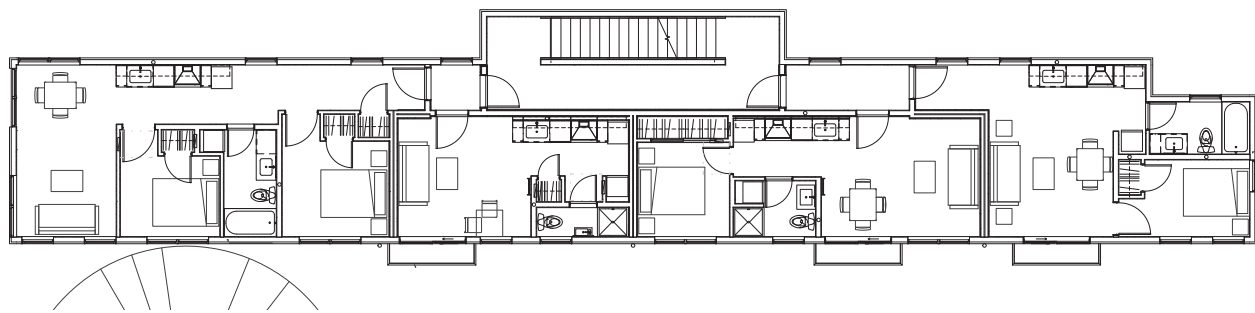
Typical upper level floor plan for 1901 E Fir St (HUP, Sylvette, 1901 E Fir St 2019).
